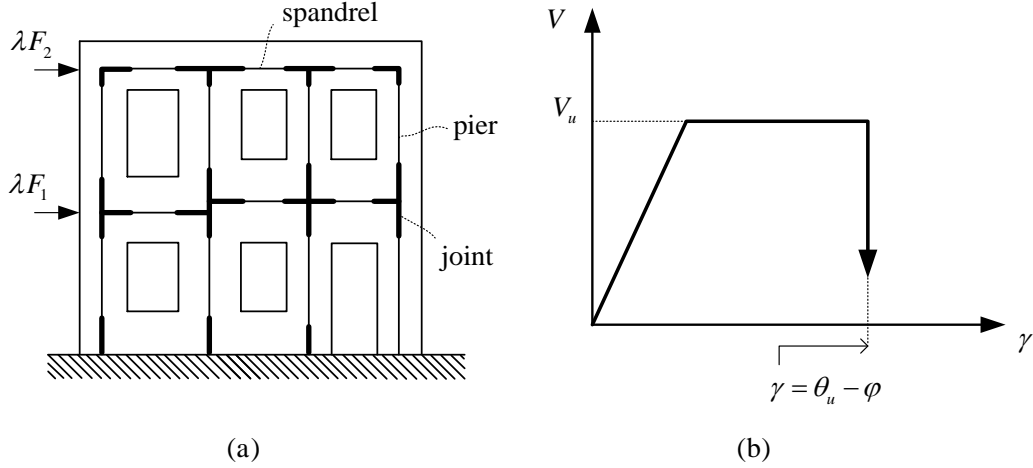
Equivalent frame idealization of a masonry wall (a) and idealized nonlinear behaviour of a pier element failing in shear (b) (Magenes, 2000).
